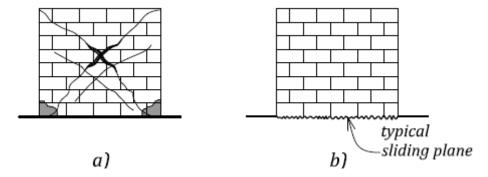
Shear failure mechanisms: a) diagonal tension<sup>1</sup>, and b) sliding shear.
